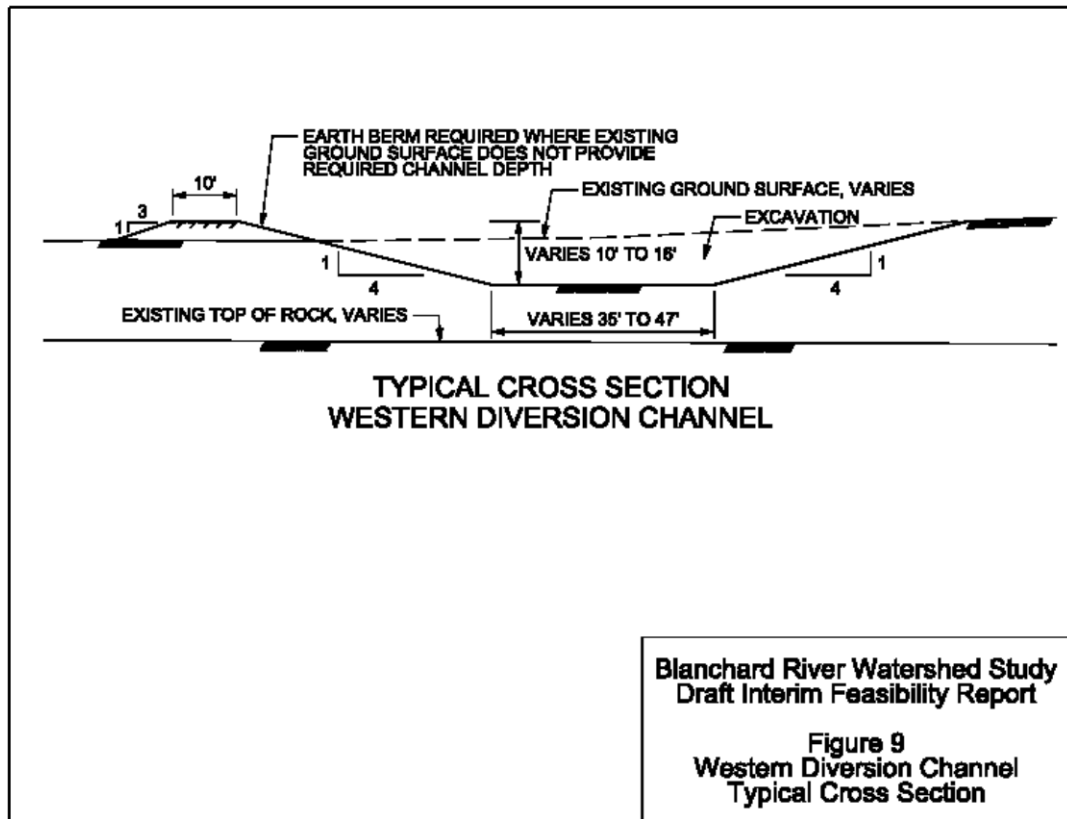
Typical Diversion Channel Cross Sections for the Alternative 2 Alignment.
